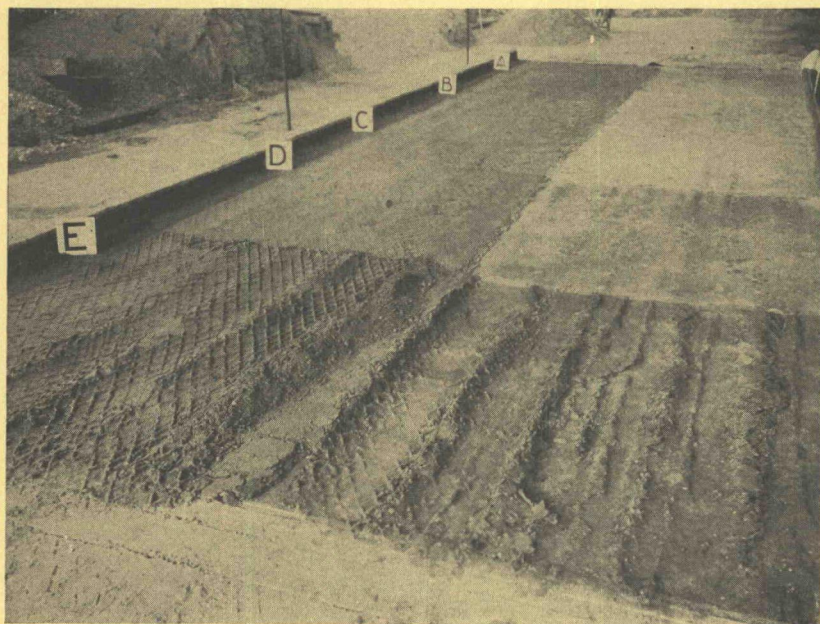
Gravel Cover on one-half of Indoor Test Road.
